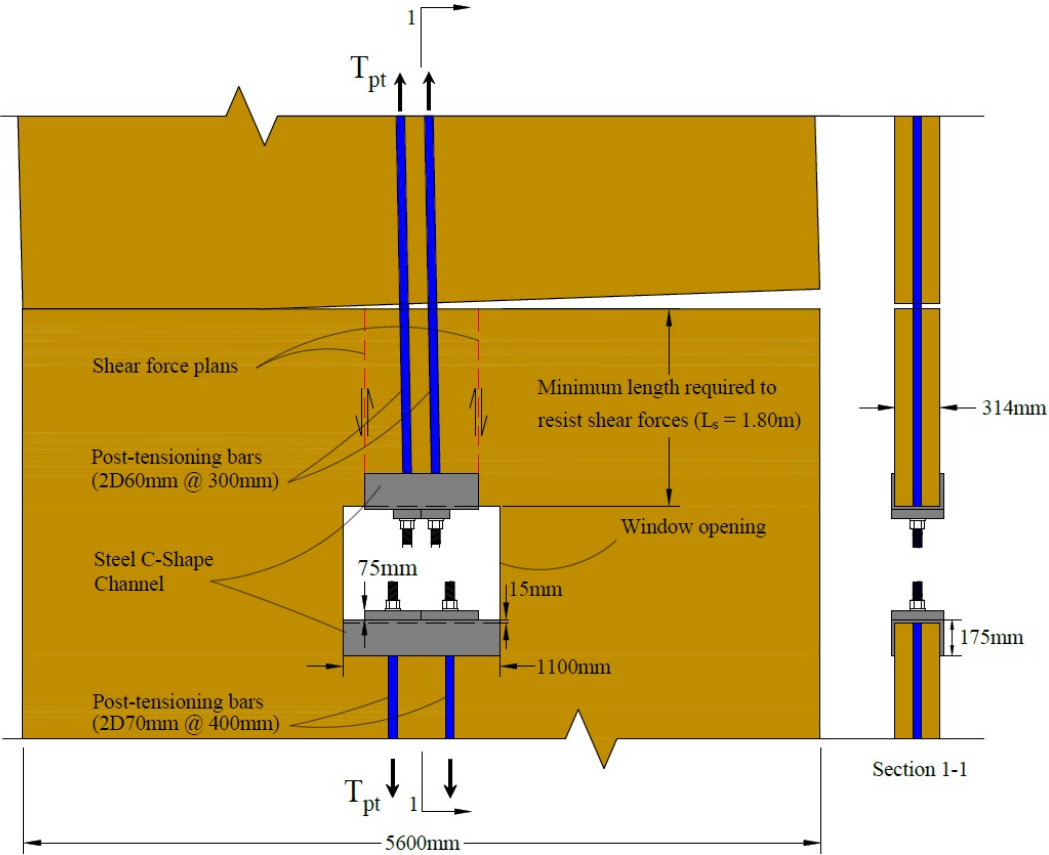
Connection design for multiple rocking segment system of case study building 5
